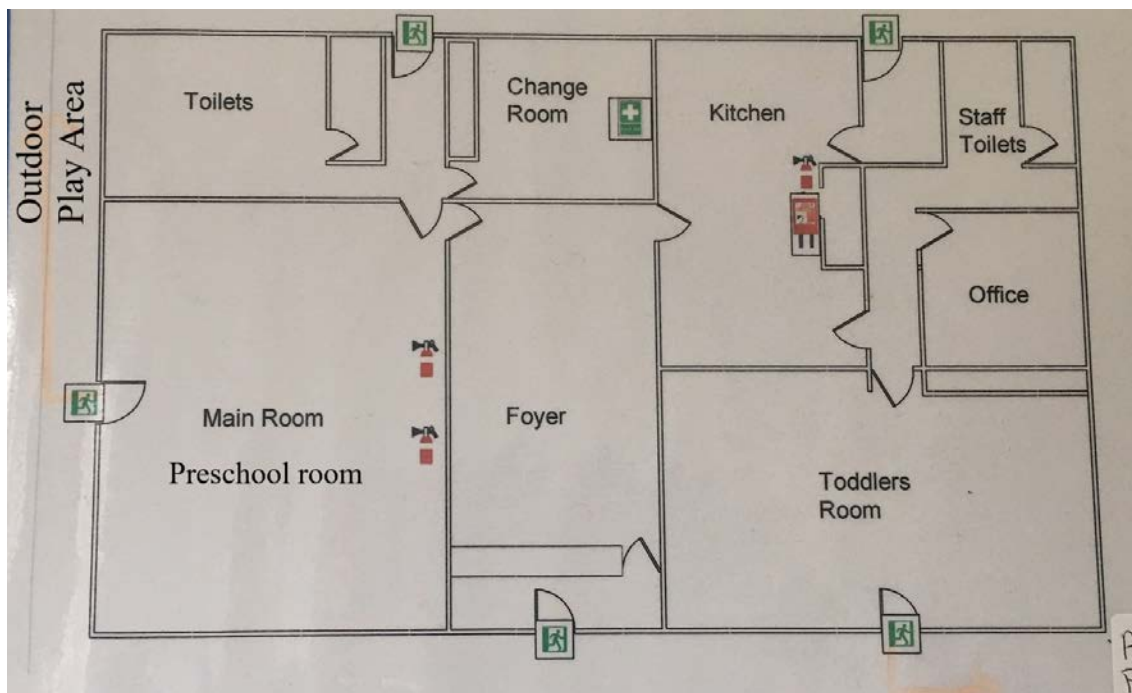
Floor plan of the preschool (collected from the centre notice board)
